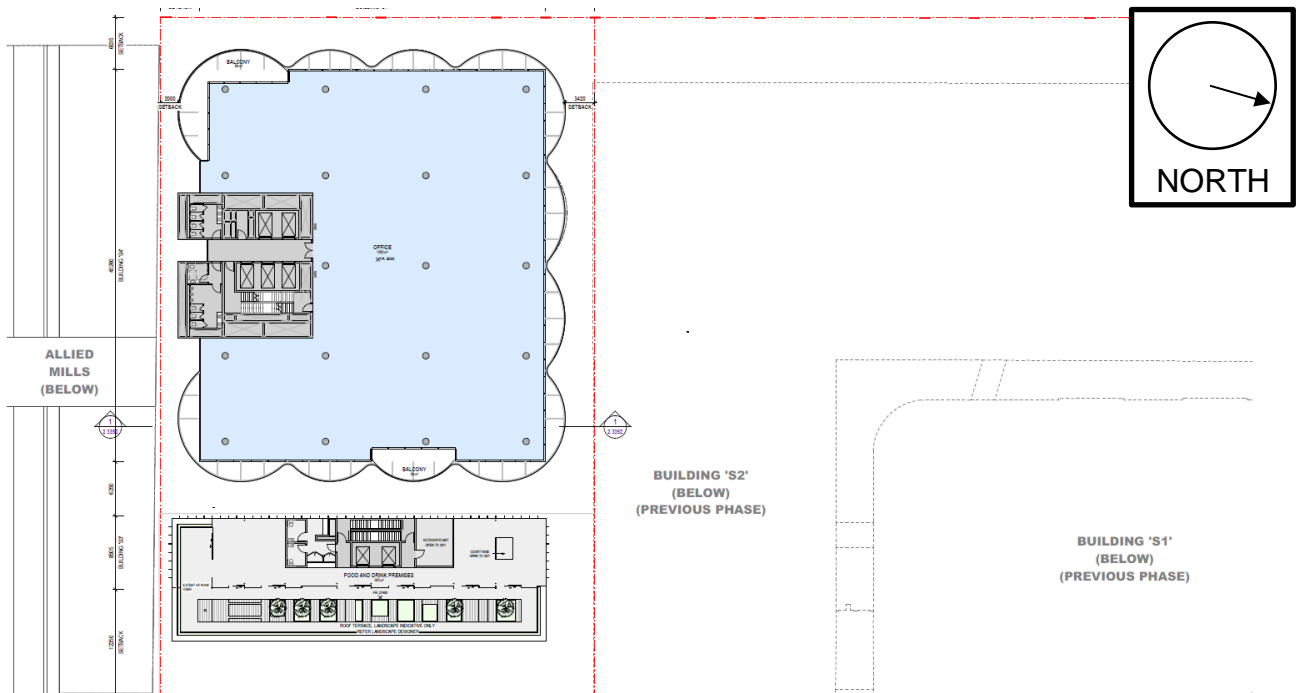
Level 4 floor plan of Stage 2 of the proposed 2-50 Elizabeth Street development
